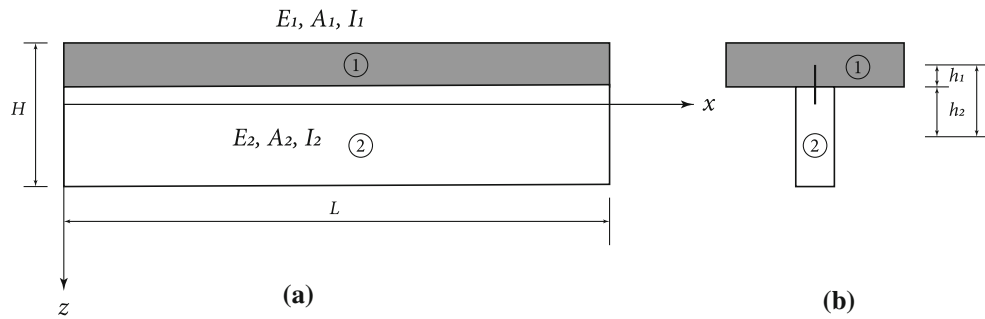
A typical composite beam and the coordinate system: a elevation; b cross section
